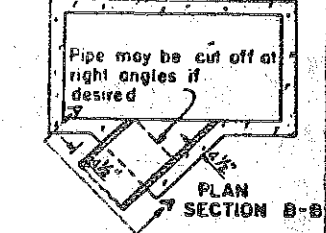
DETAIL OF BOTTOM CONSTRUCTION WHEN INLET SERVES AS MANHOLE
